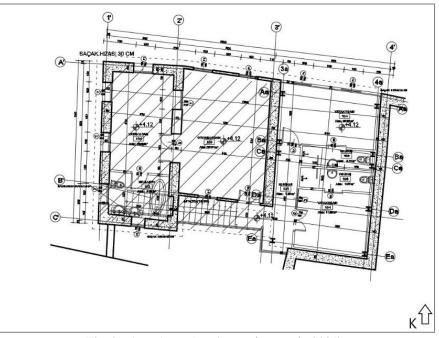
First Floor Plan (Güvenir Beyatlı, 2021)
